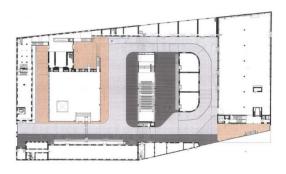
Floor Plan of the Fondazione Prada. Drawing © OMA 2015
